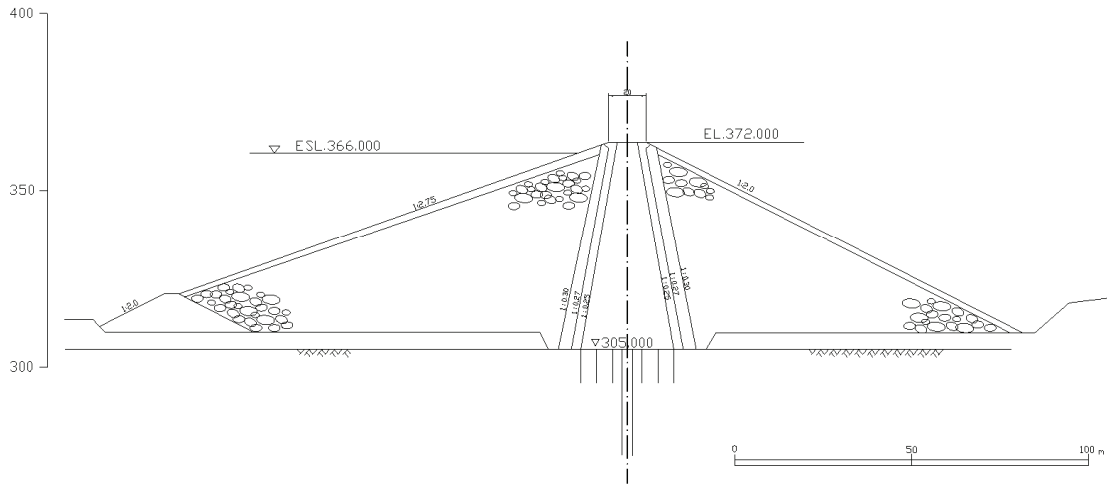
Typical Cross Section of Zoned Rock-fill Dam
